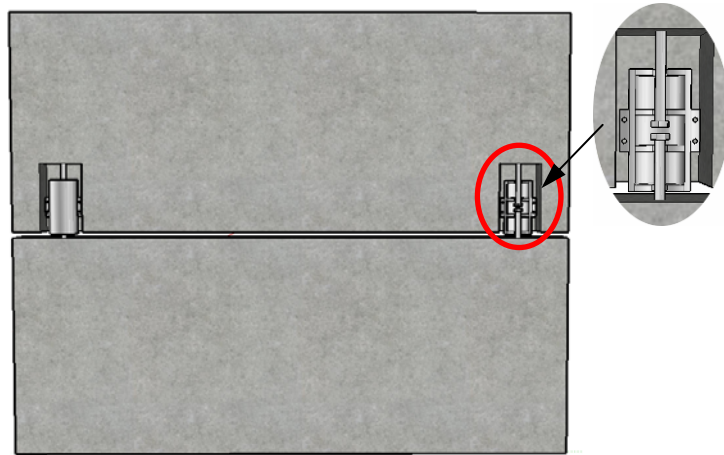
The proposed application of the CS-Sleeve for precast concrete load-bearing panel system
